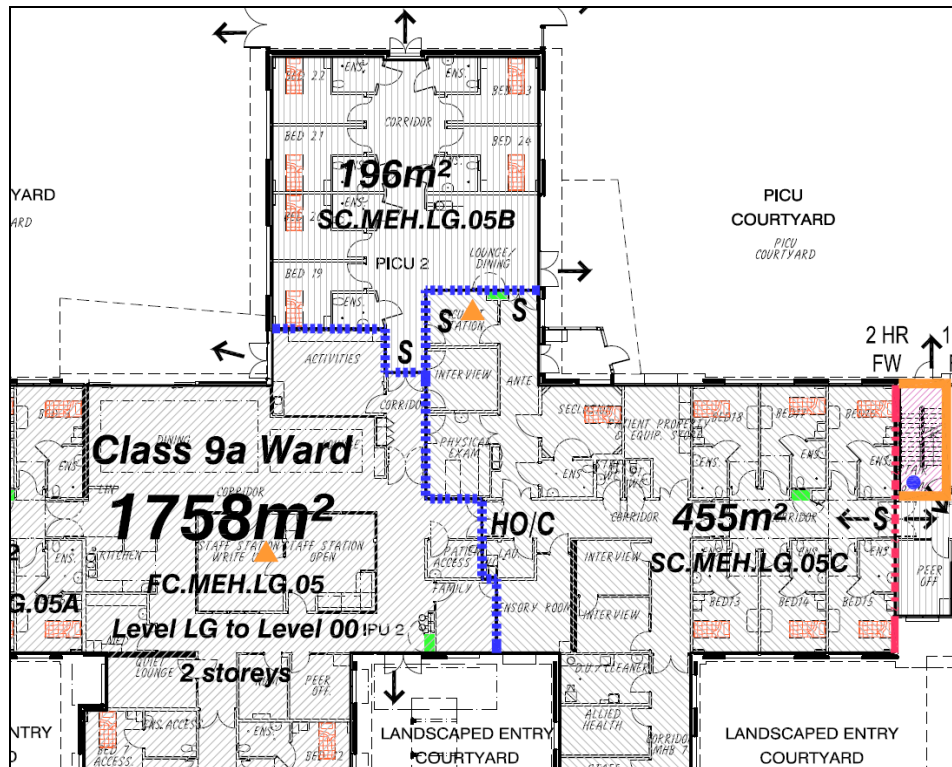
Lower Ground floor plan (centre) showing extent of non-compliance with fire hose reel requirement (to interview room) (adapted from part drawing PSH-AR-MEH-DWG-26LG100)
